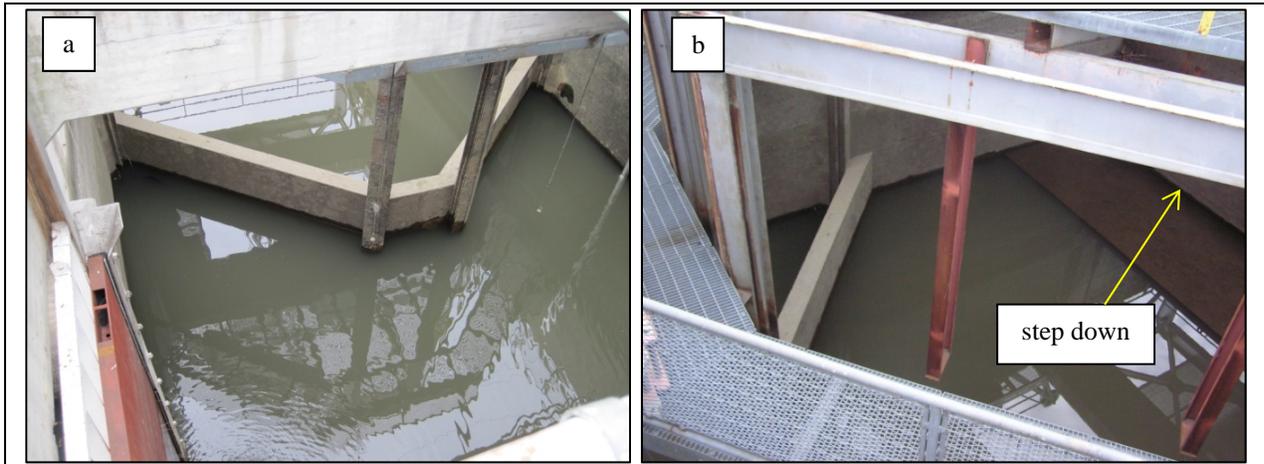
McNary South fish ladder exit section between the count station and the fishway exit. a. V-shaped stub wall that is approximately 2-3 feet high. b. 6 inch step down in floor elevation. Image a. by USFWS. Image b. by D. Benner.
